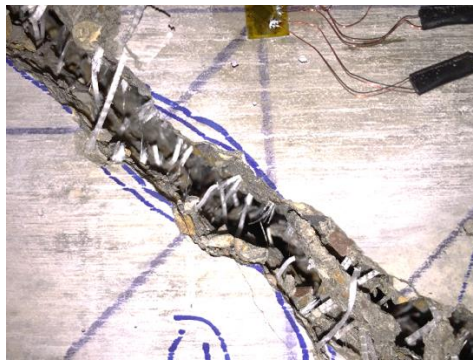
Typical photo of bridging the crack by using polypropylene fibers in the large-scale beam specimens
